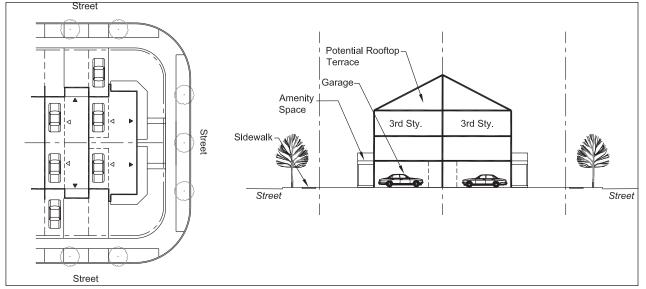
Conceptual Plan View and Cross-Section of Back-to-Back Townhouses
